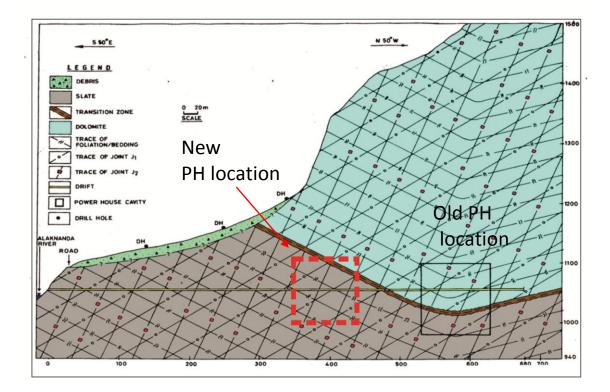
Geological cross section across powerhouse area showing the older and new PH proposed locations.
